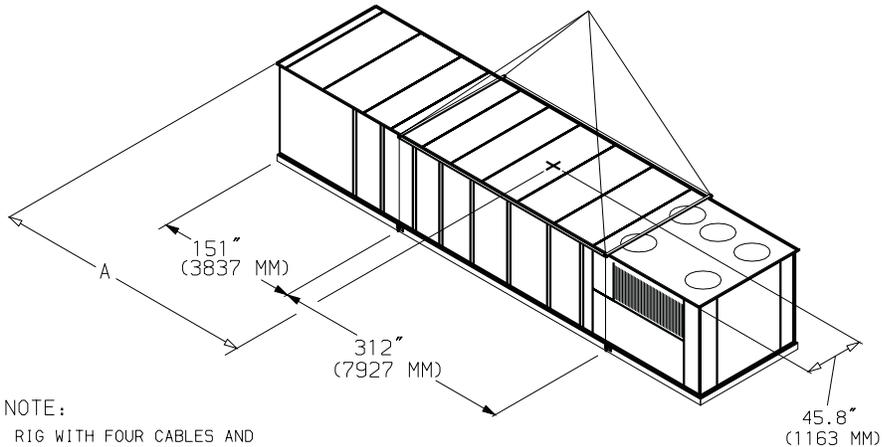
Rigging Label — Size 055,060 Units (Extended Chassis)
